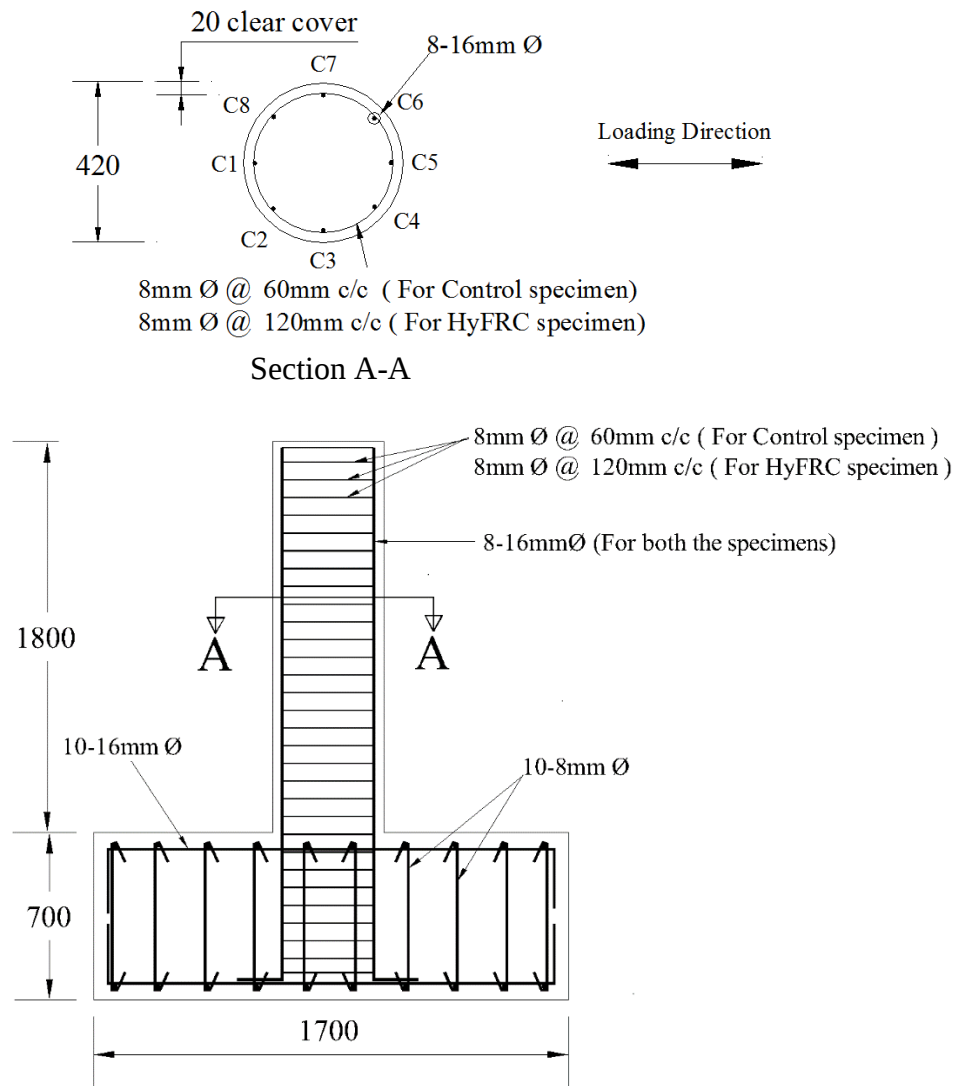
Reinforcement details of scaled pier model (All dimensions are in mm)
